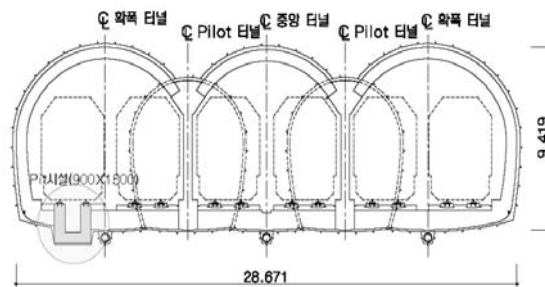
Standard cross-section of typical 3-Arch tunnel of Shinbundang line
